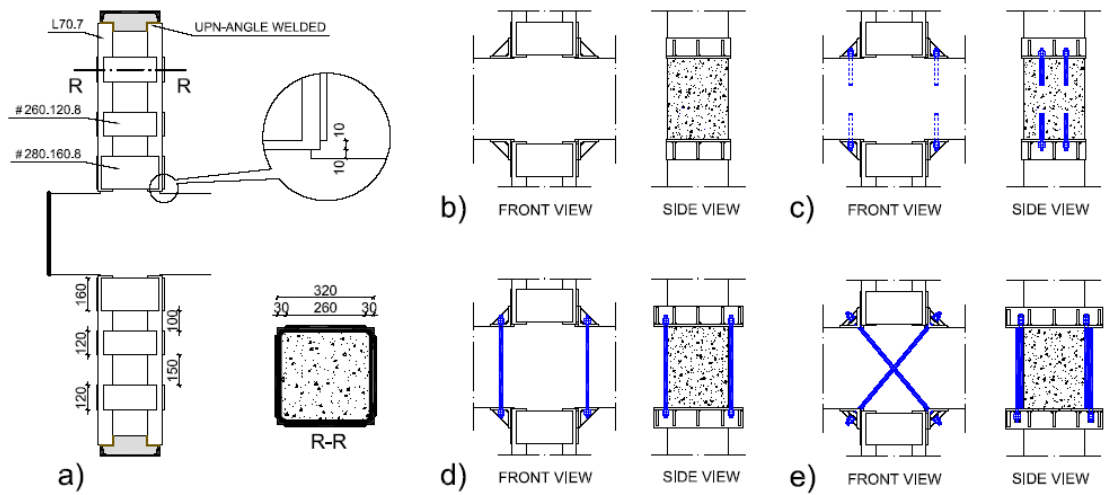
Strengthening columns and joints. a) columns, b) C-series, c) CA-series, d) VB-series, e) DB-series
